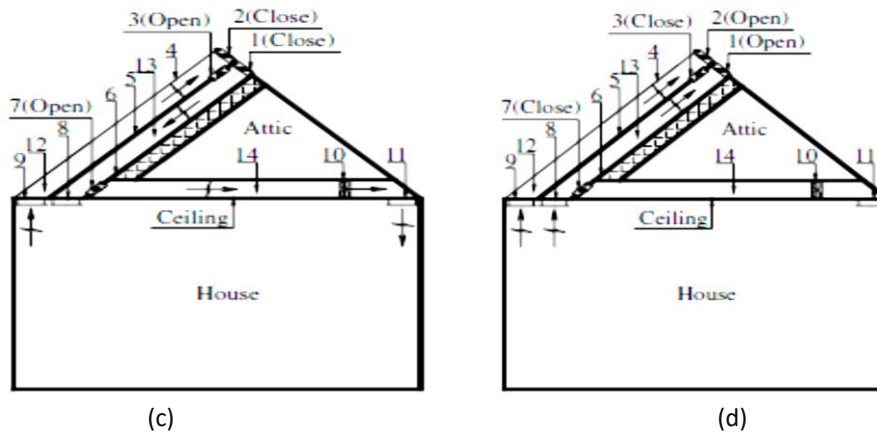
SC used to enhance the building ventilation and room heating [15].
